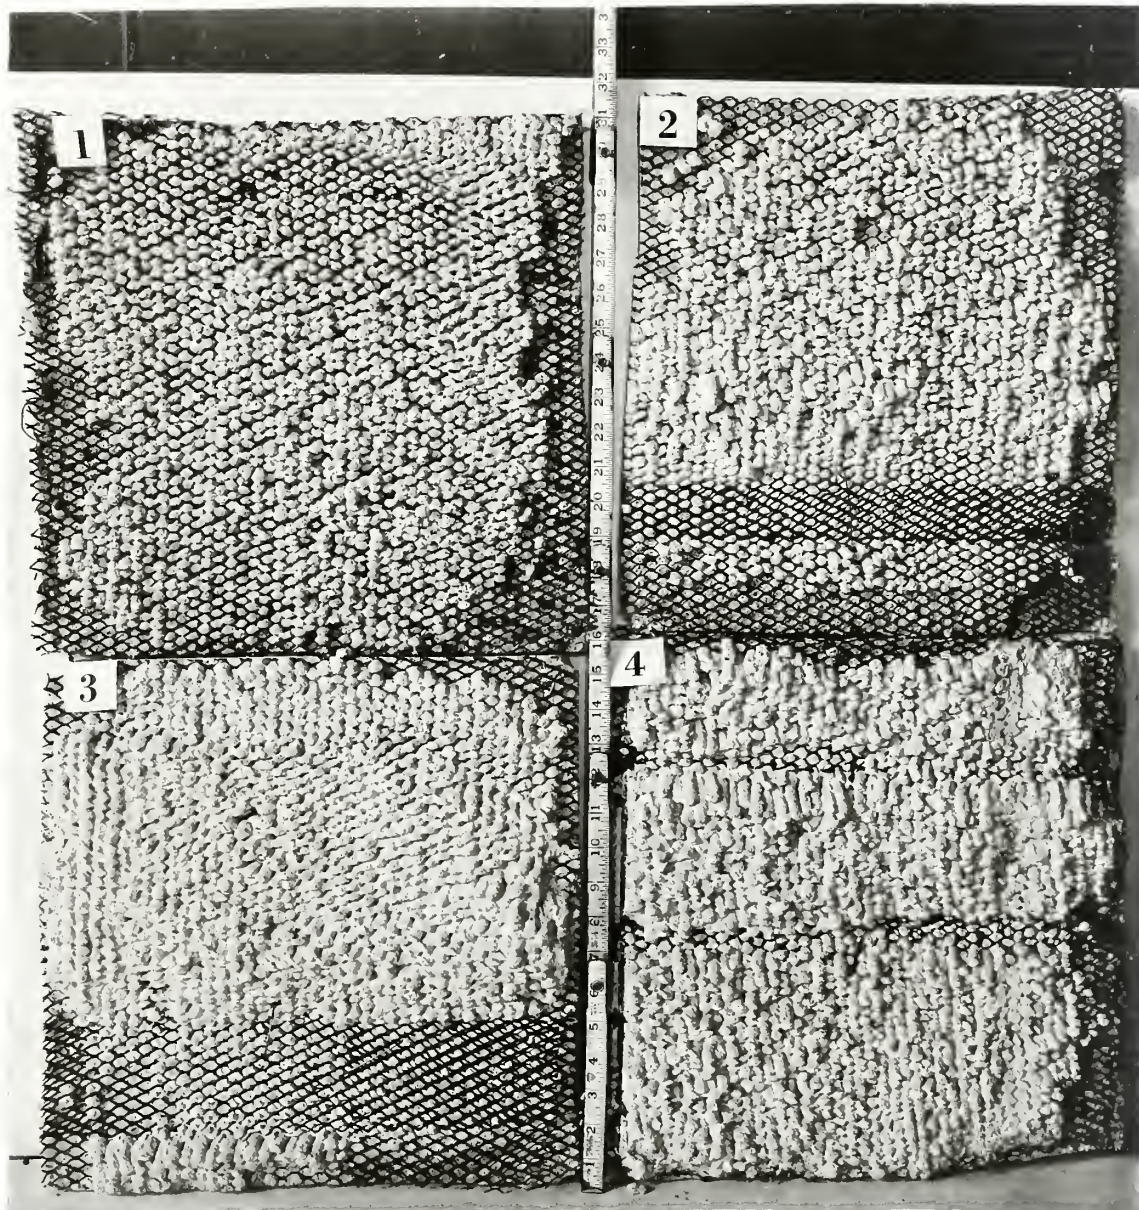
PROJECT 501-228. SPECIMENS OF PLASTER FROM WALLS OF (1) ROOM W-318, (2) CORRIDOR WALL OF BASEMENT BETWEEN DOORS OF ROOMS 7 AND 8, (3) ROOM W-192, AND (4) LINEN CLOSET S523 SHOWING PLASTER KEYS.
